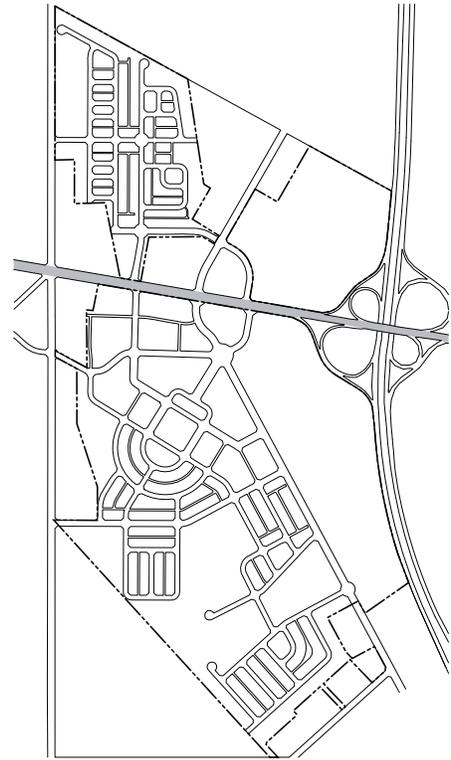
depicts the Circulation Regulating Plan. Roadways and other circulation improvements depicted on the plan are deemed fixed. Any exceptions from these improvements shall be subject to the review and approval of the Planning Board.
